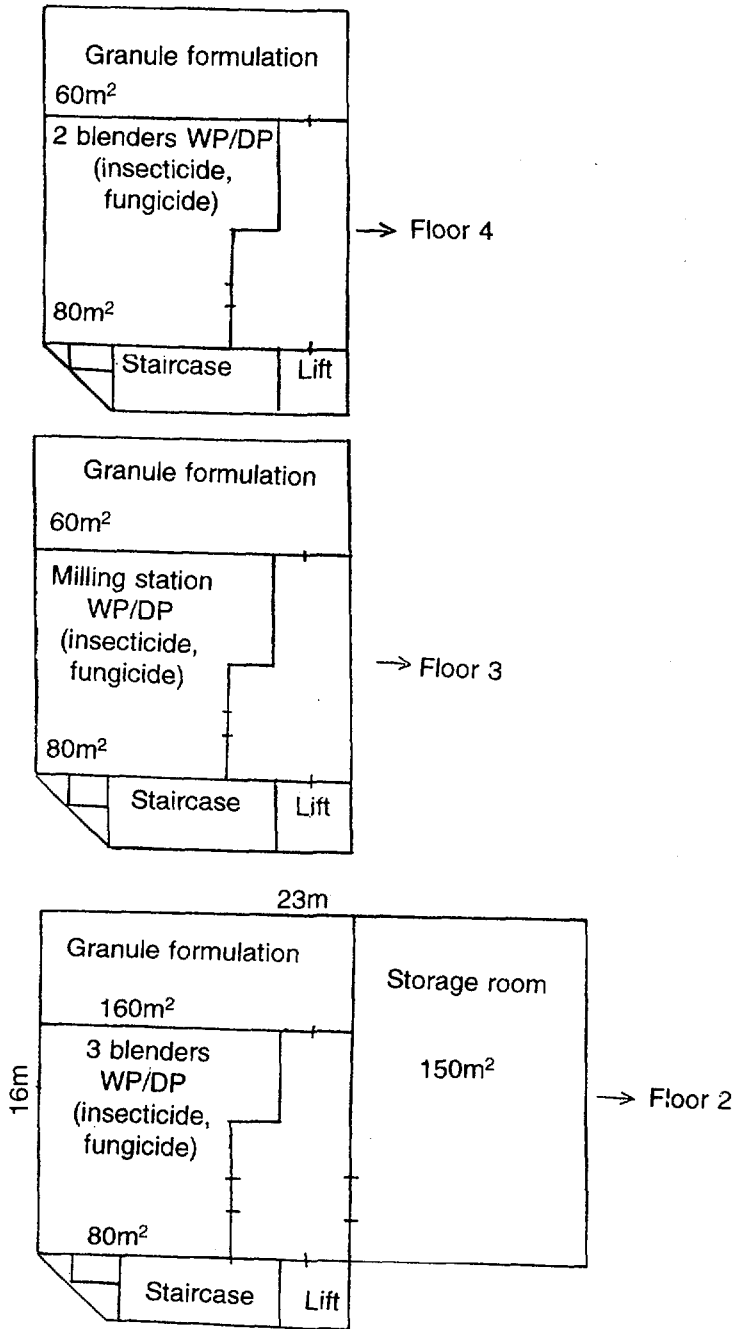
Layout for second, third and fourth floor of a formulation plant
